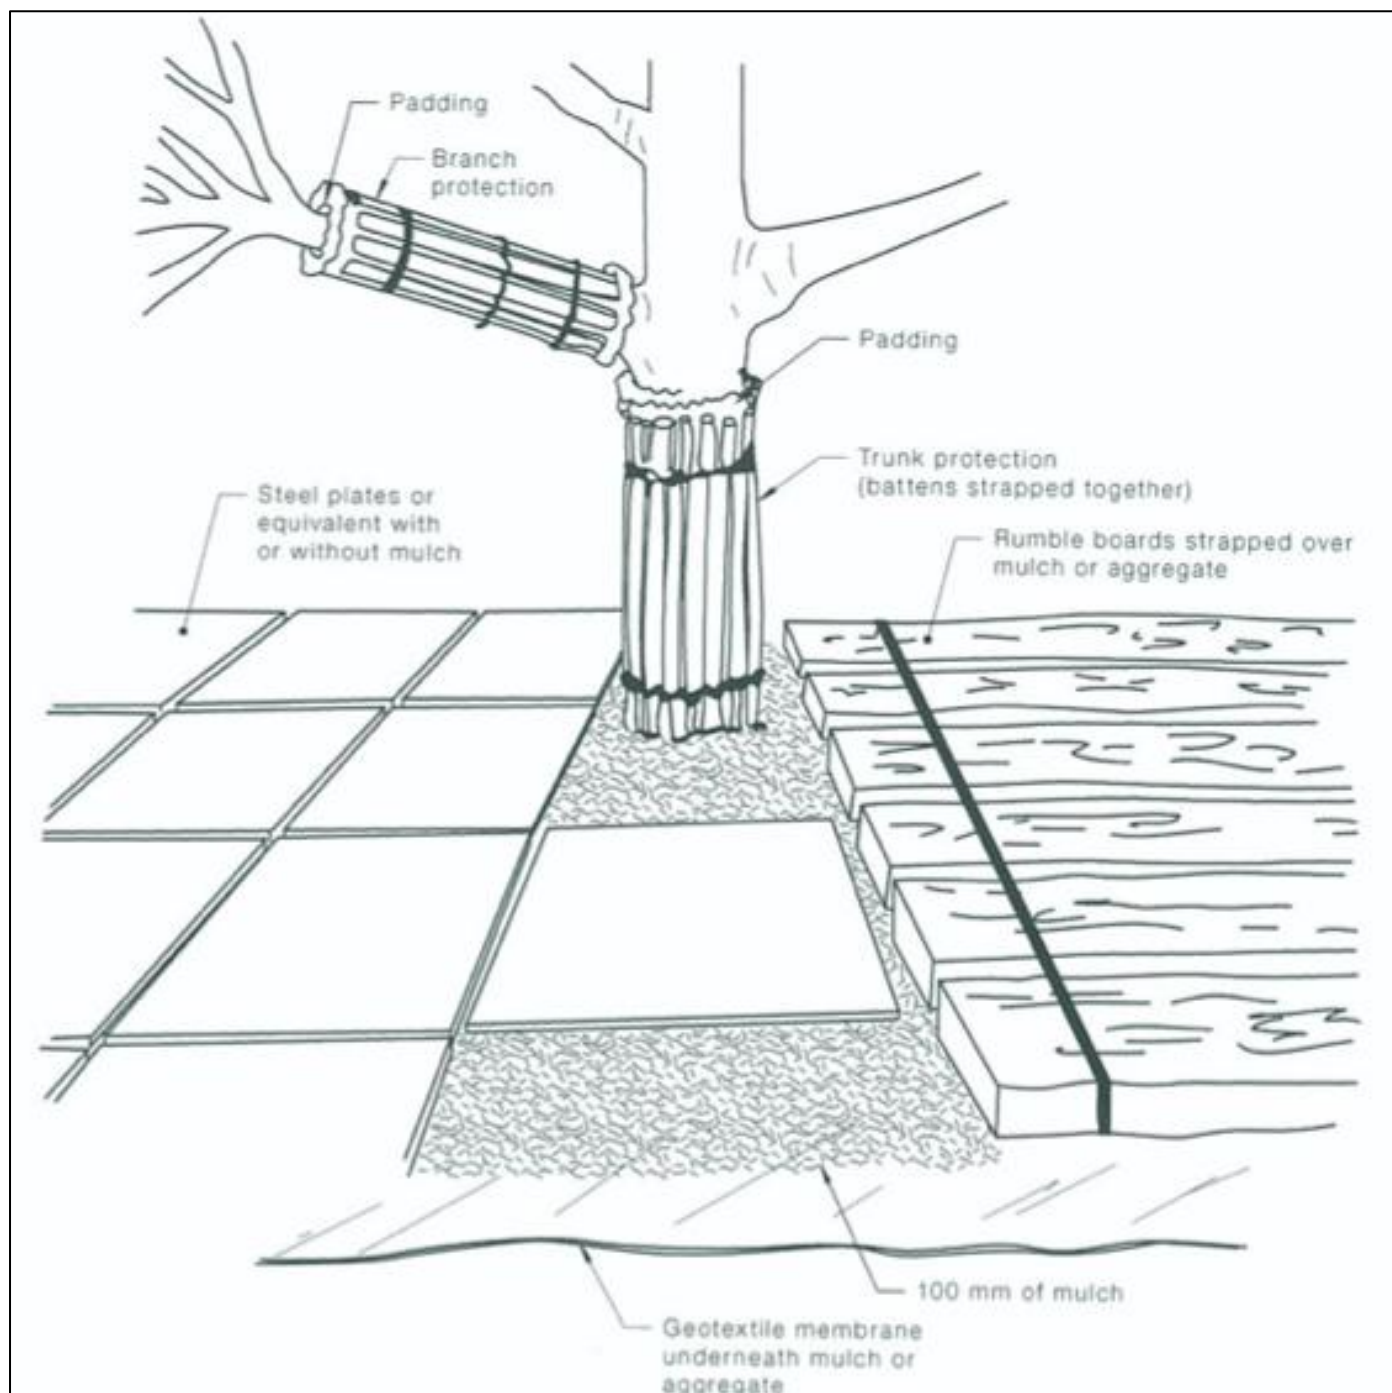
Stem and ground protection measures specified in Section 4.5.3 of *AS4970 (2009)* for temporary access within a fenced protection zone. Steel plates or rumble boards are shown to be suitable for ground protection over mulch and geotextile fabric.
